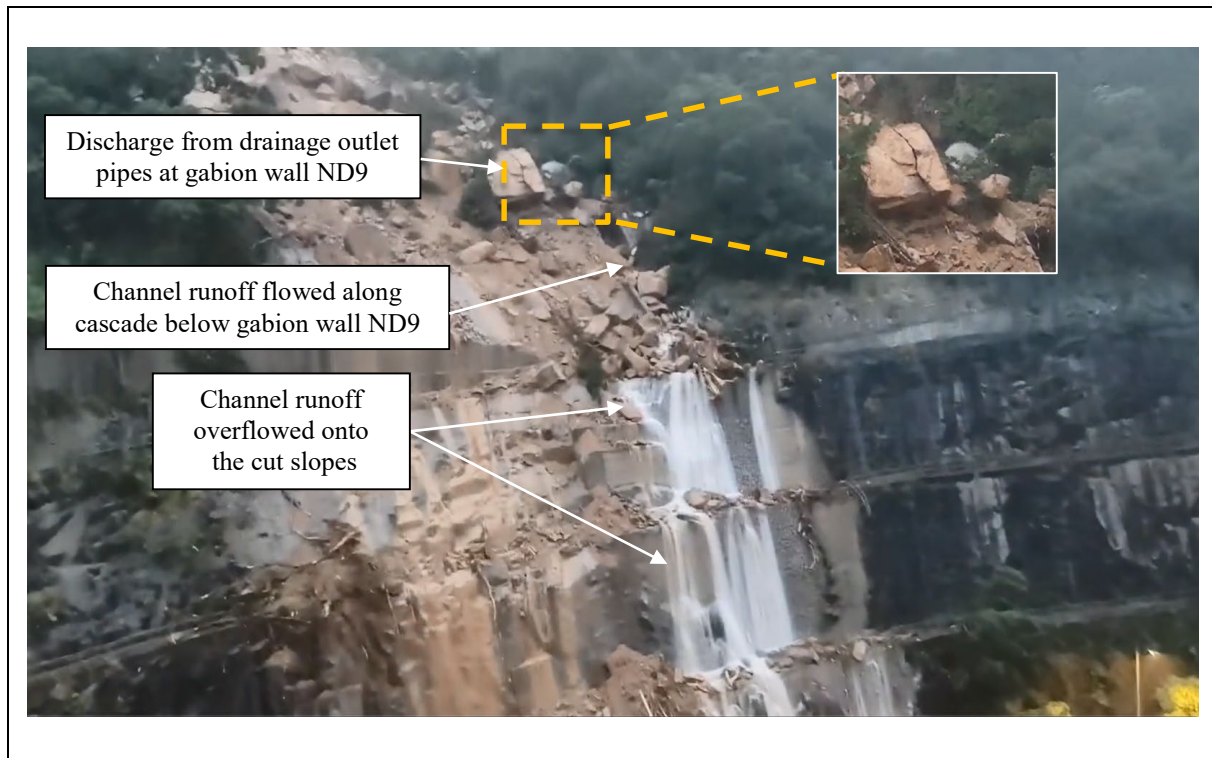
Channel Runoff along Cascade below Gabion Wall ND9 (Photograph taken on 8 September 2023)
